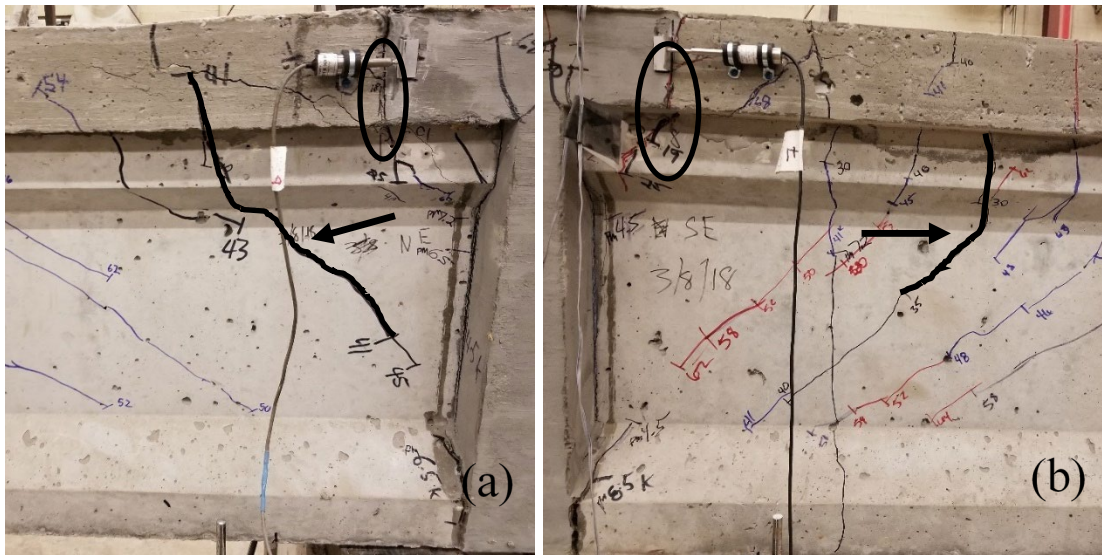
Initial flexural cracking on the NC3-N girder at 25 kips of load and initial flexure-shear cracking on the NC3-N girder at 41 kips of load (a) and initial flexural cracking on the NC3-S girder at 19 kips of load and flexure-shear cracking on the NC3-S girder at 35 kips of load (b). Dark circles show the initial flexural cracking near the continuity joint and arrows point to the dark lines that indicate the initial flexural shear cracking.
